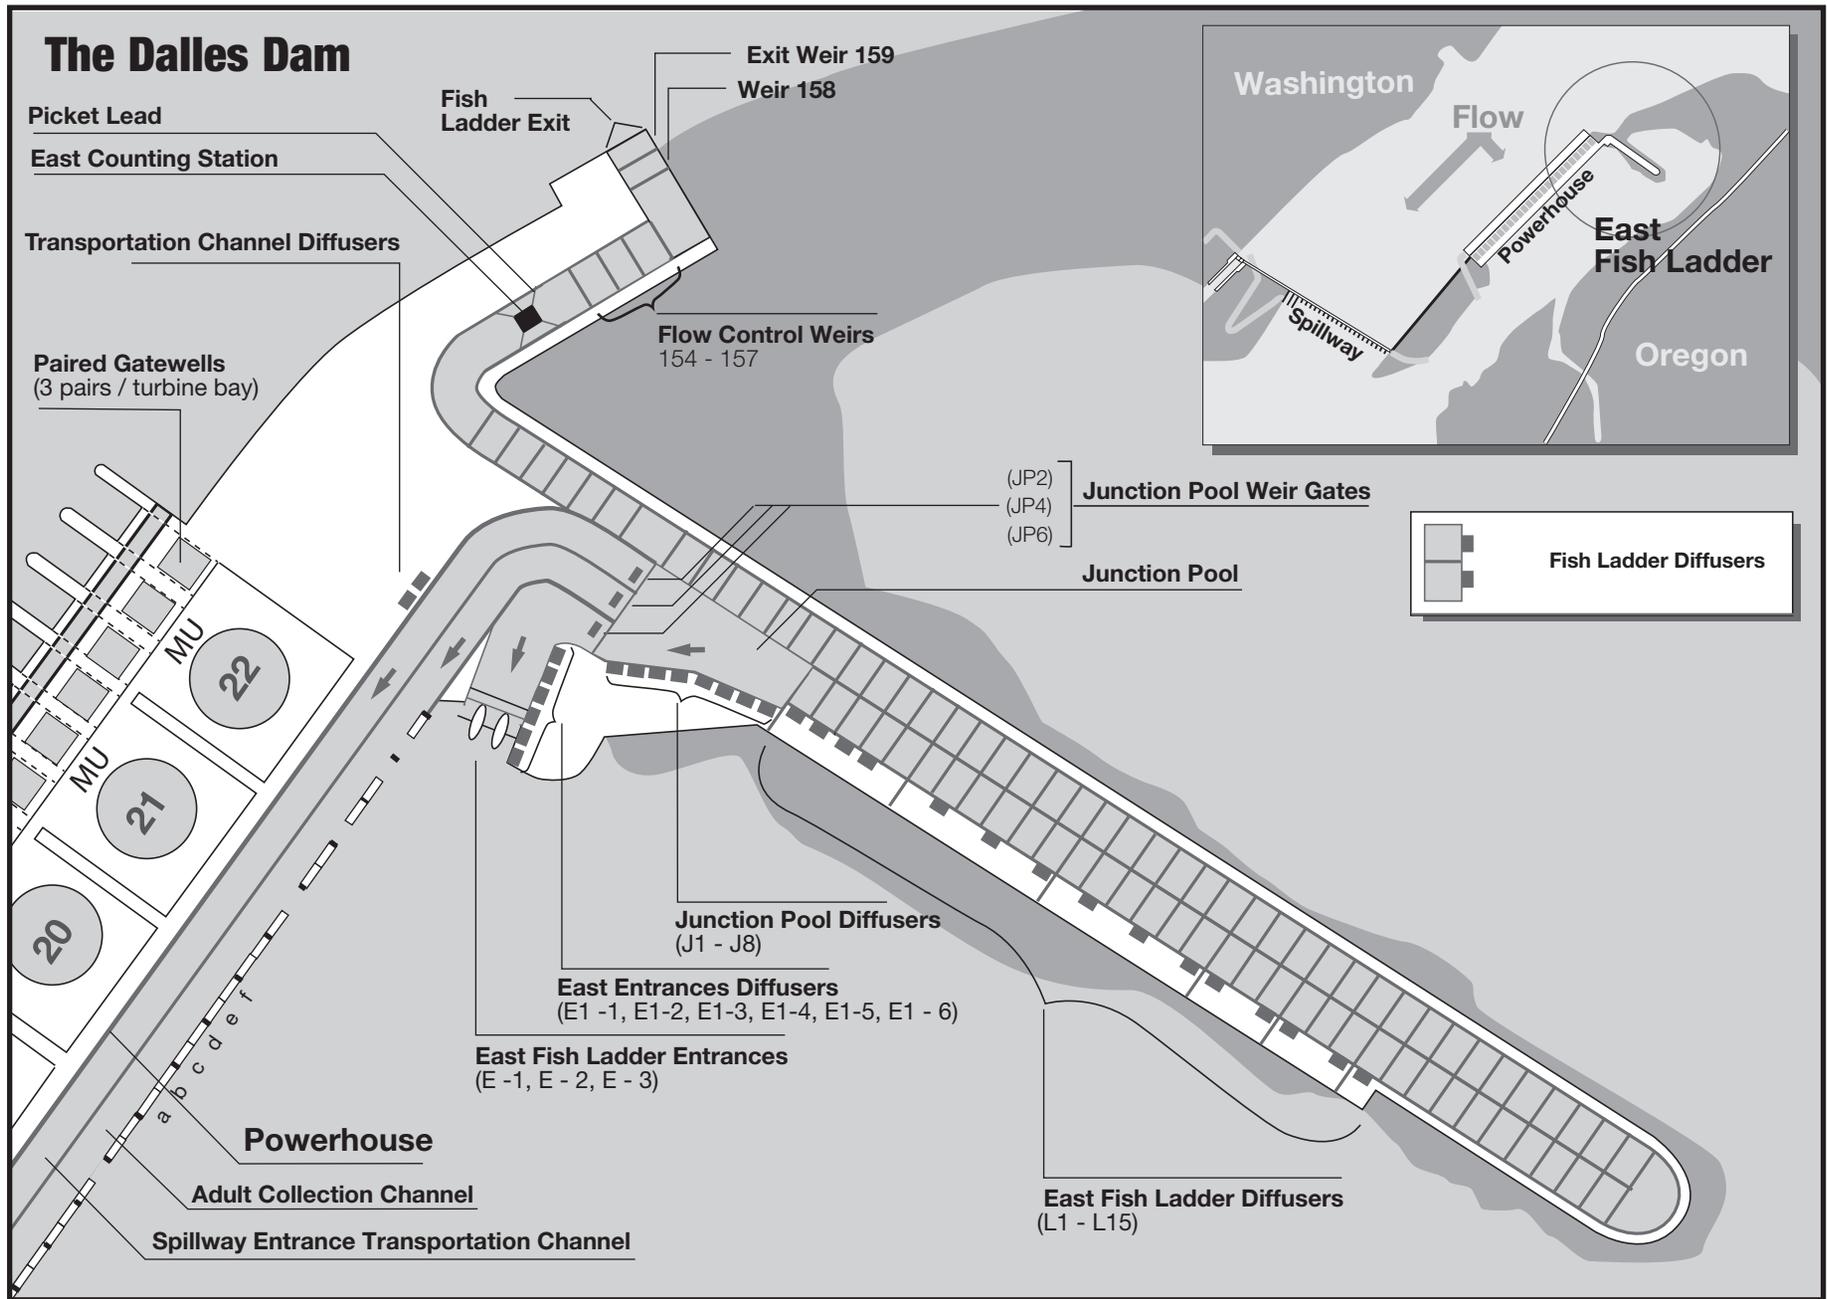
The Dalles Dam East Fish Ladder.
